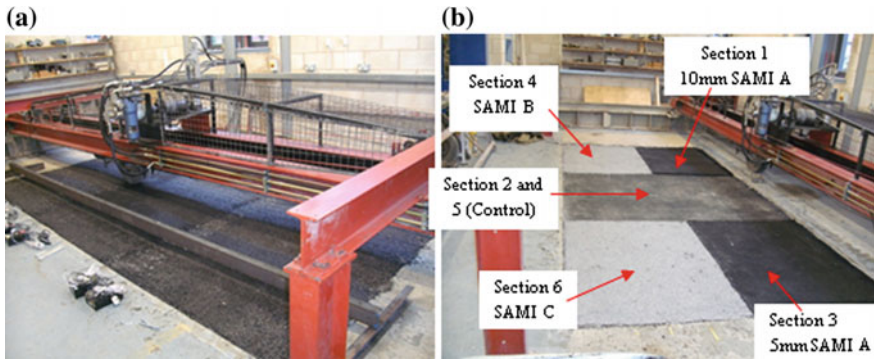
Pavement test facility: a during trafficking; b under construction
